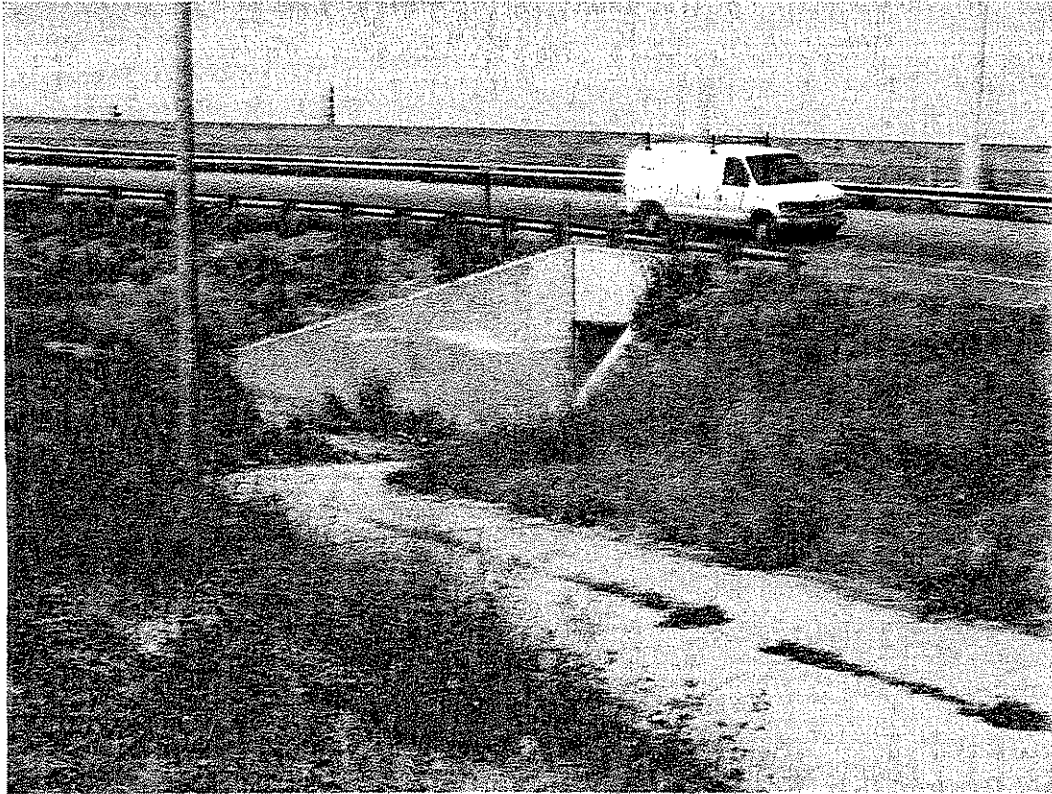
The other side of the tunnel. The photograph shows the sloping walkway leading from the tunnel to Bailey Road. The slope makes it difficult for those with mobility problems to use it. The condition and secluded nature of the tunnel makes it unappealing to all pedestrians and bicyclists. As mentioned earlier, County staff has yet to see a pedestrian use this tunnel for pedestrian purposes.
